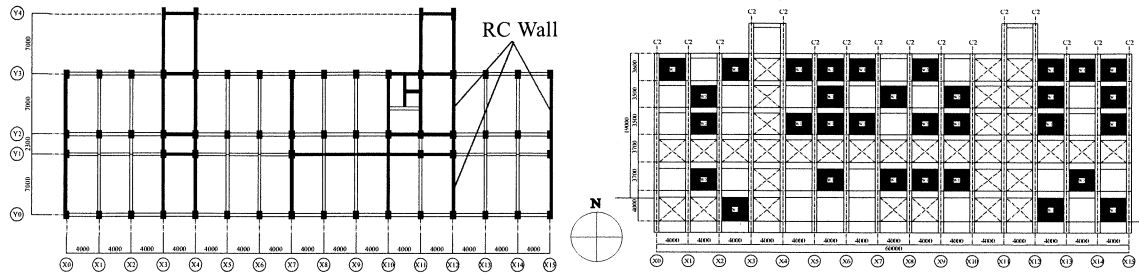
Plan and Elevation of Midorigaoka-1st Building
